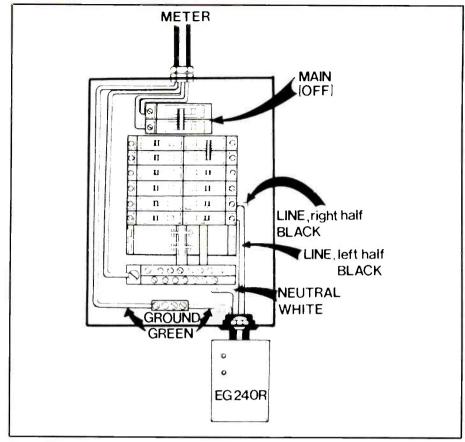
The whole-house protector should be mounted below the circuit-breaker panel as shown.
